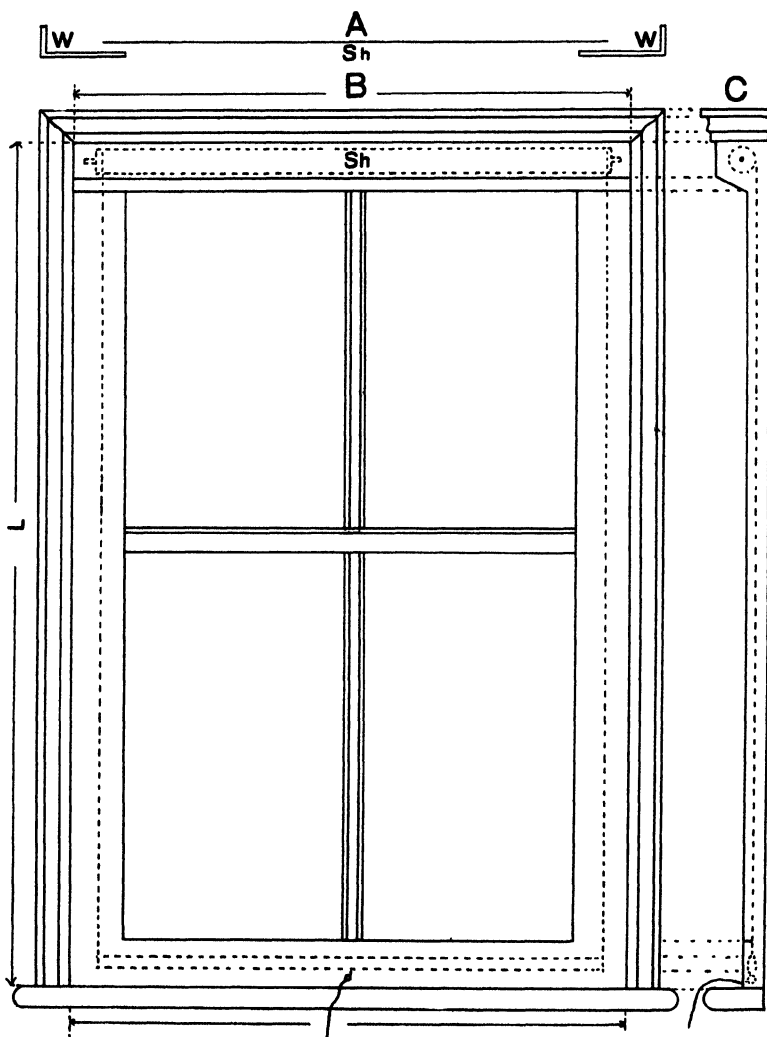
FACE AND SECTIONAL VIEW OF A WINDOW SHOWING HOW THE LIGHT-EXCLUDING SHADE CAN BE INSTALLED AFTER THE BUILDING IS CONSTRUCTED.
